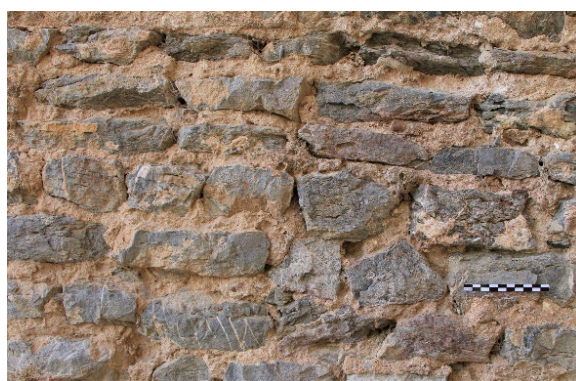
Rubble stone masonry, cella wall, Water Temple
